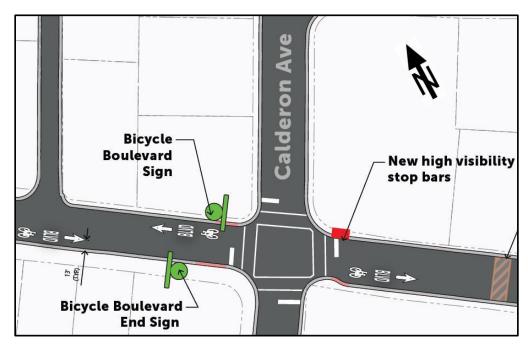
Church Street and Calderon Avenue Recommended Improvements
